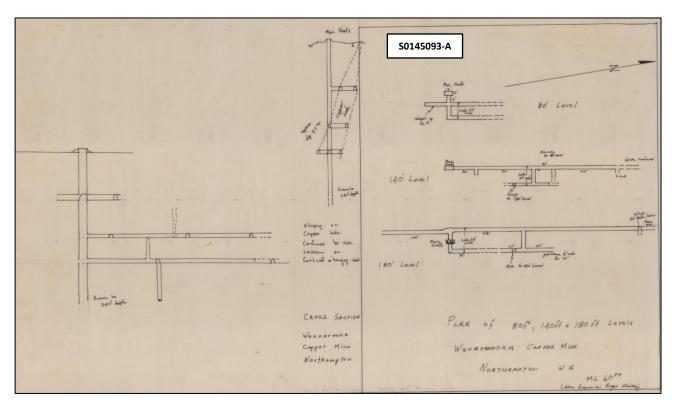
984 Wanerenooka copper mine plan of levels (1957)
